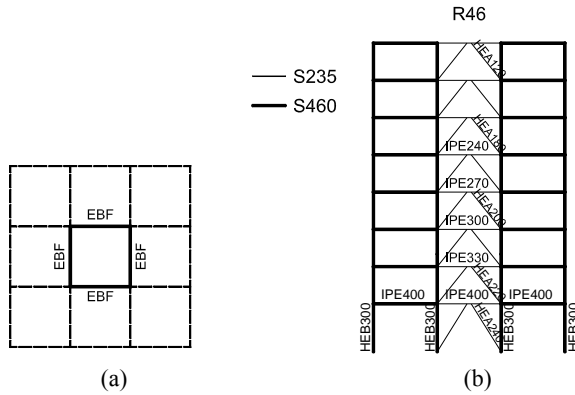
Structural layout: (a) plan view; (b) elevation dual frame R46
